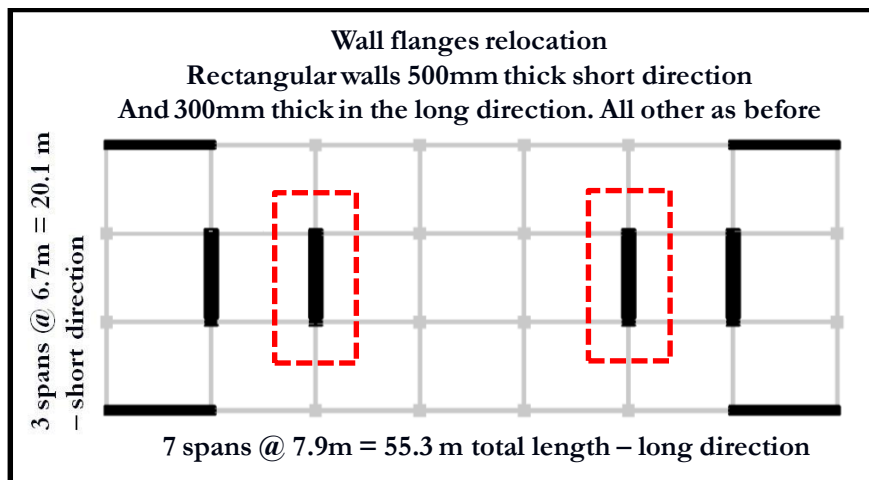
Wall relocation in the ideal building of Figure 9.4: rectangular walls with increased initial axial load as a consequence.
